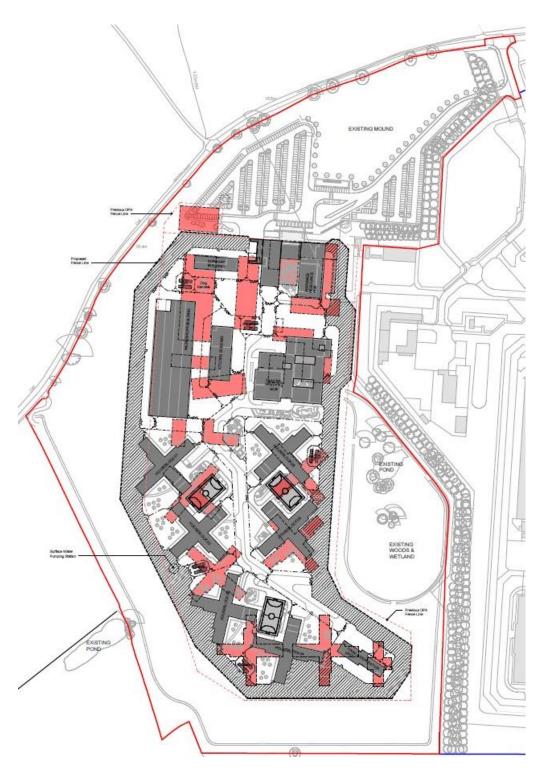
Proposed Reserved Matters Site Plan with Indicative Building Footprints from the Outline Application added in red
